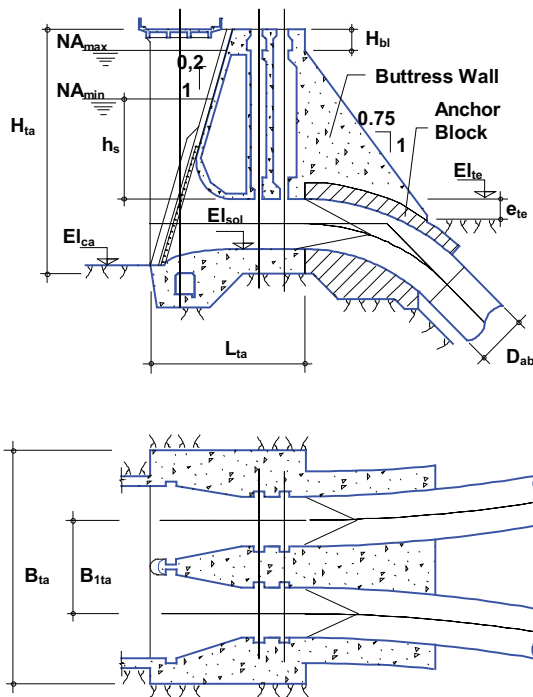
Typical cross-section and plan of a gravity intake.
